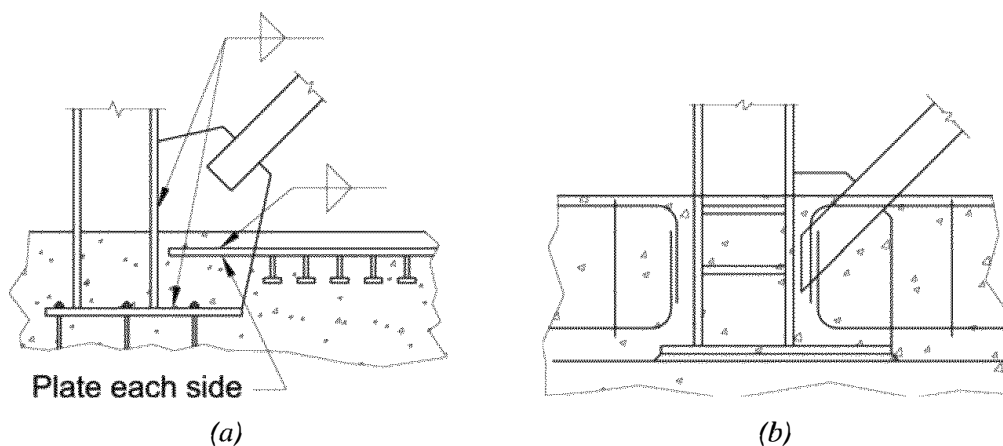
Examples of shear transfer to a concrete grade beam.
